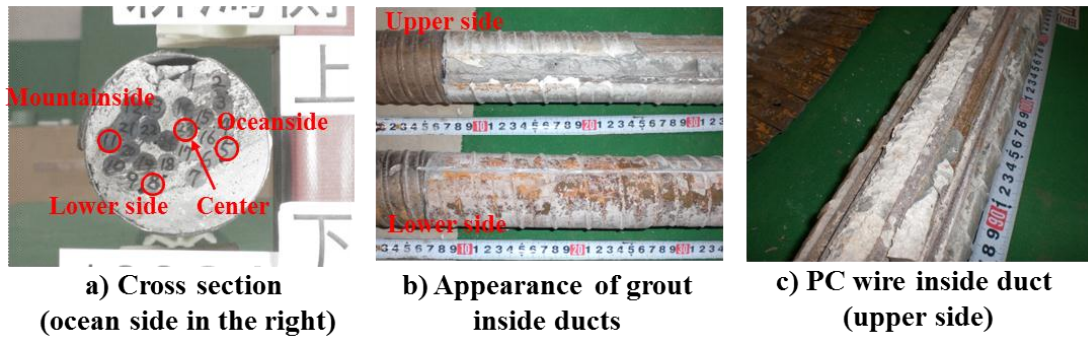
Dissection research of C4 cable of G3 girder of the first span in C bridge
